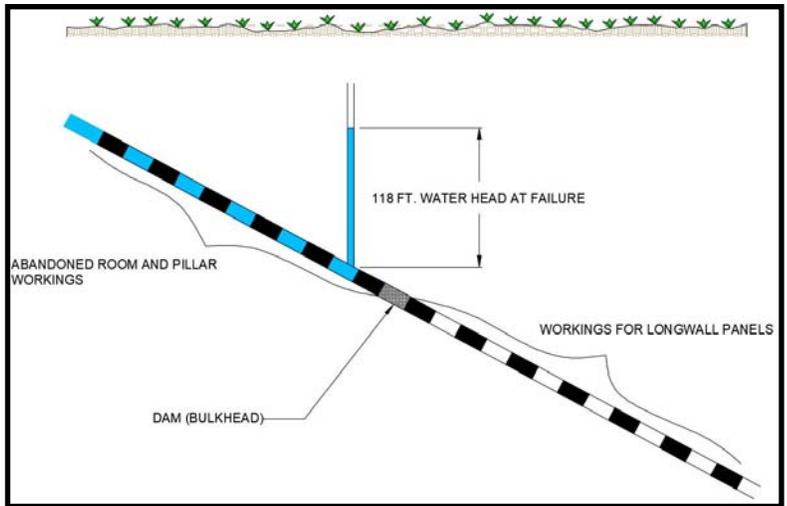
CROSS-SECTION ILLUSTRATING DAM LOCATION DOWNSTREAM FROM FLOODED ABANDONED WORKS AND UPSTREAM FROM ACTIVE LONGWALLING
